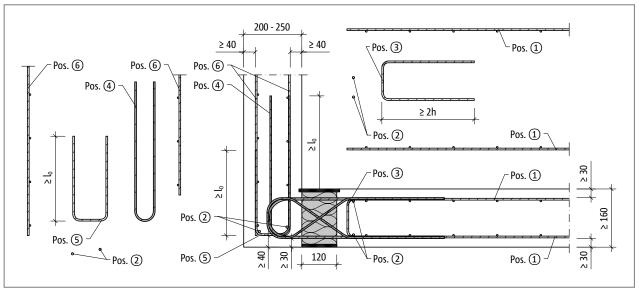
Schöck Isokorb[®] XT type F: On-site reinforcement with parapet/balustrade width b = 200 - 250; on-site reinforcement b = 160 - 190 such as b = 200 - 250 without Pos. 5
